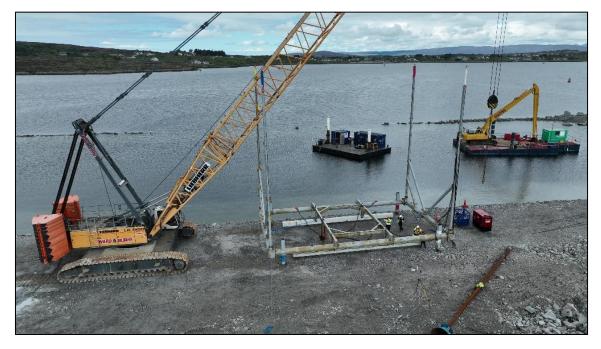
Bespoke frame used to accurately lower and position the foundation beams for the quay wall in the trench.
